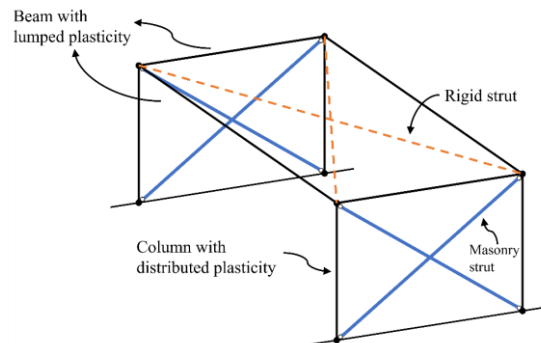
Schematic view of the frame with masonry infills modelled as single-struts in OpenSees.
